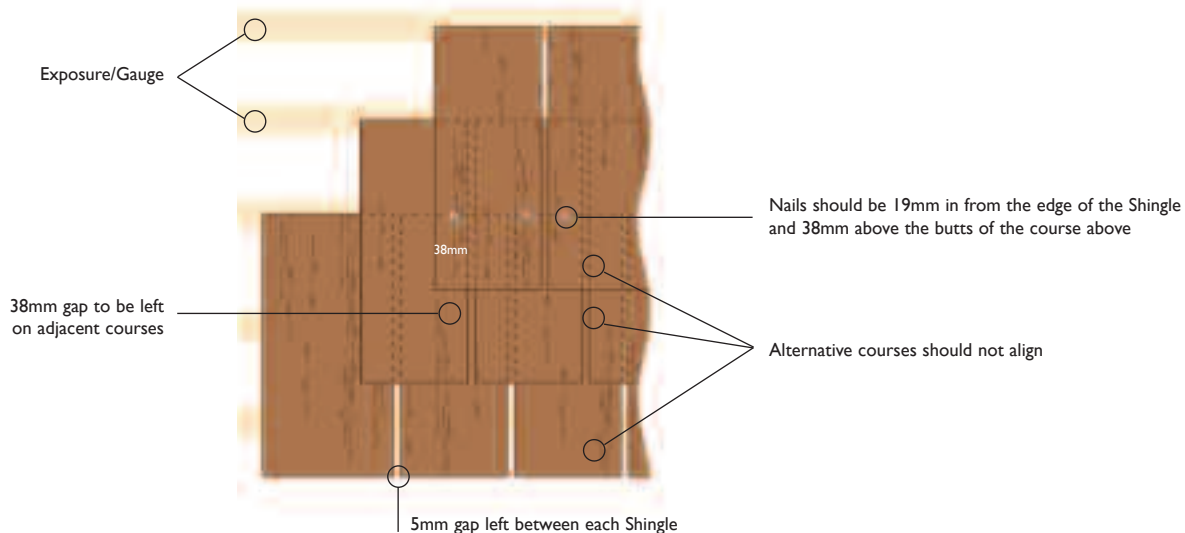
CEDAR SHAKES FIXING DETAILS
